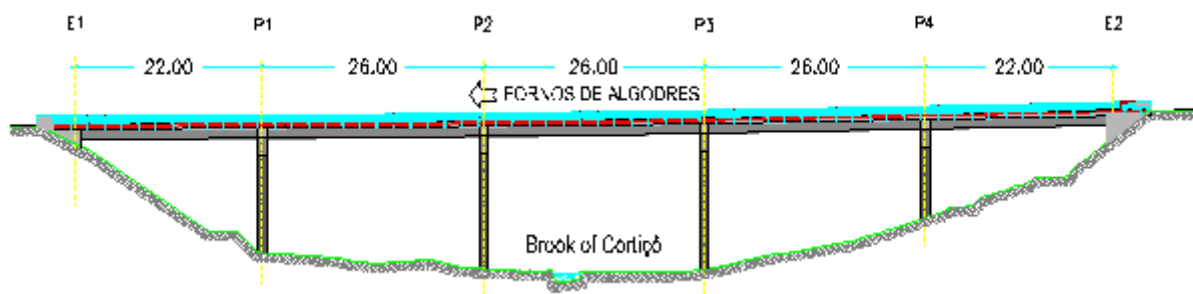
Elevation of the bridge over the Cortiçô brook (ASCENDI, 2003)
